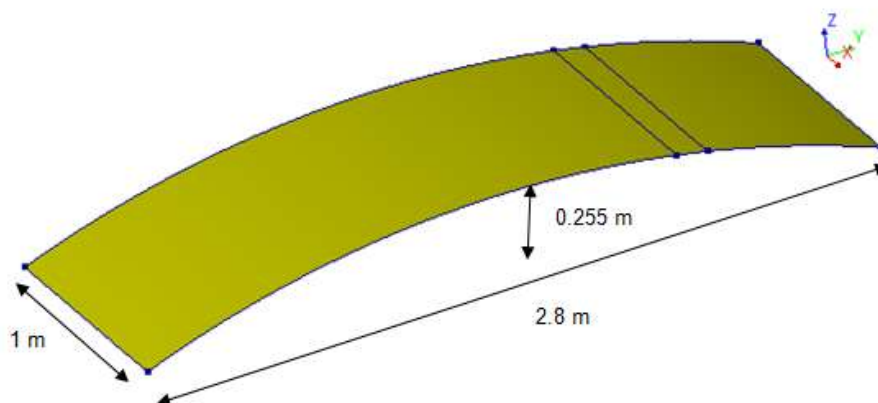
Dimensions for the 3D shell model Tile vault and Composite Tile – Concrete vault.
